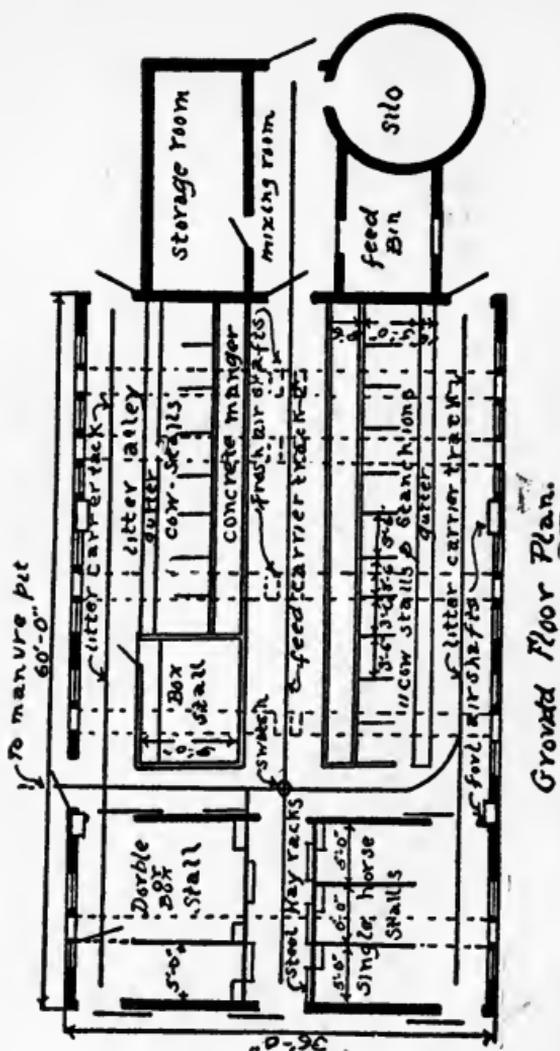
Floor Plan of Large Dairy and Horse Stable, Showing the Layout of Stalls and Alleyways
